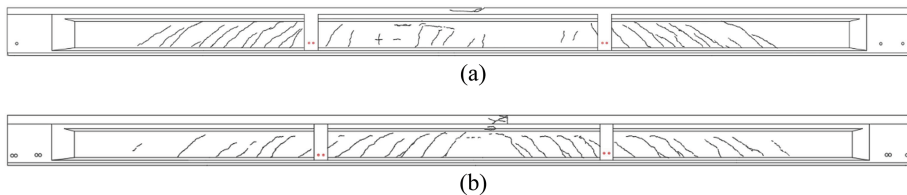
Crack pattern after the load tests: (a) B7-P47/46 (4-P bending test), and (b) B8-P47/46 (3-P bending test) girder.
